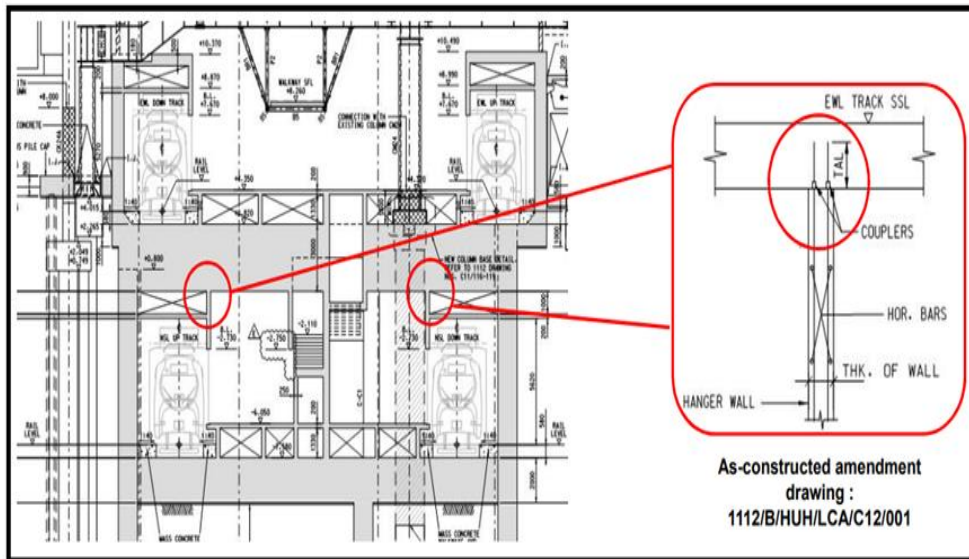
Connection details of OTE between the soffit of EWL slab and the OTE duct
